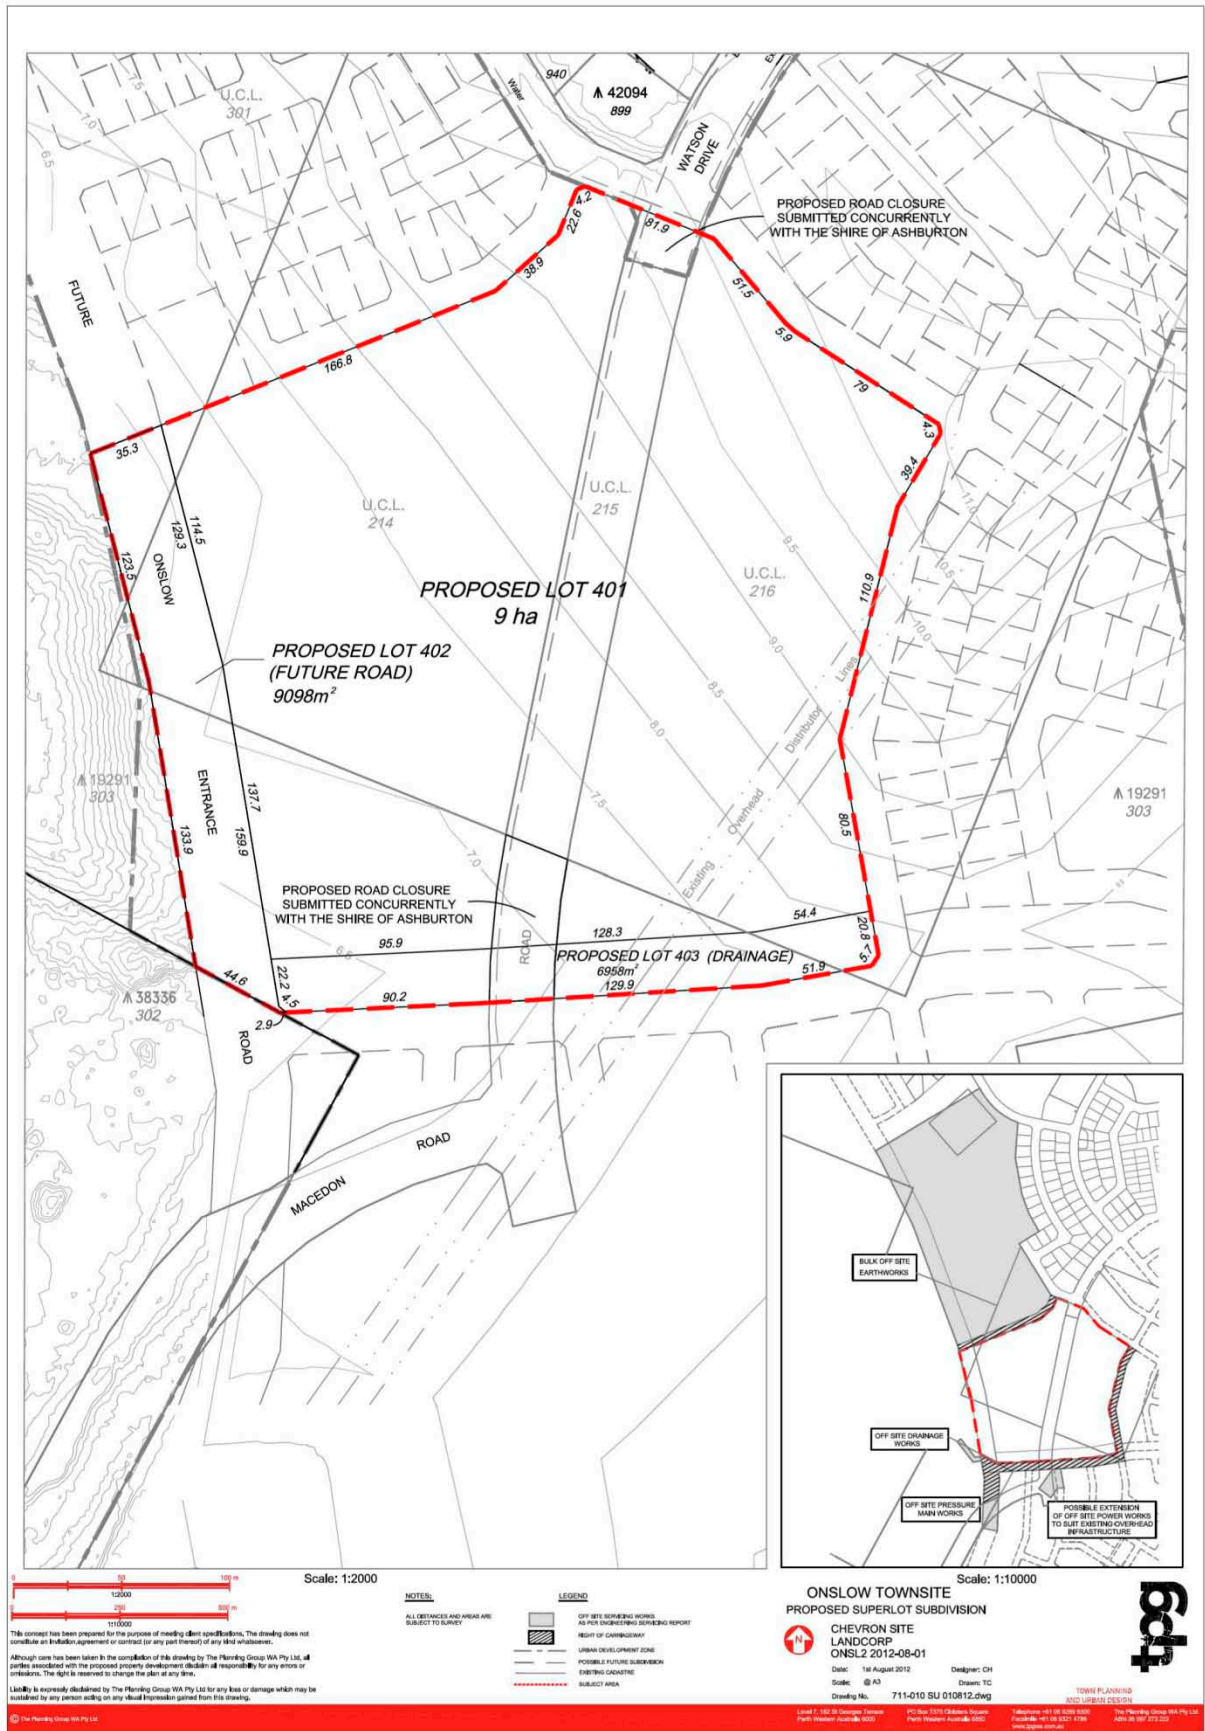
Wheatstone FIFO Operations Village Site – Plan of Subdivision [Source: TPG]
